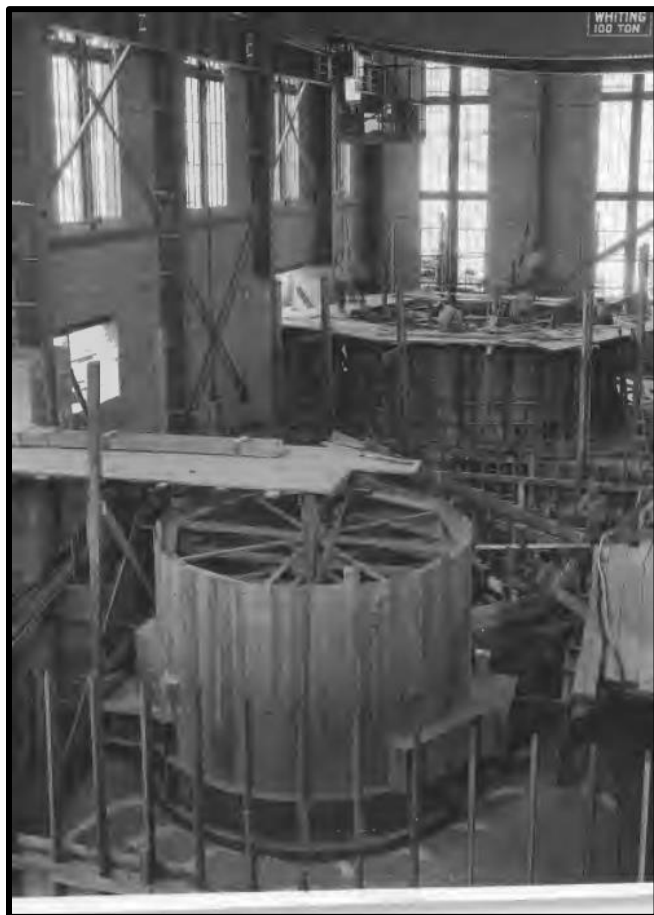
CUTLER POWERHOUSE UNDER CONSTRUCTION
